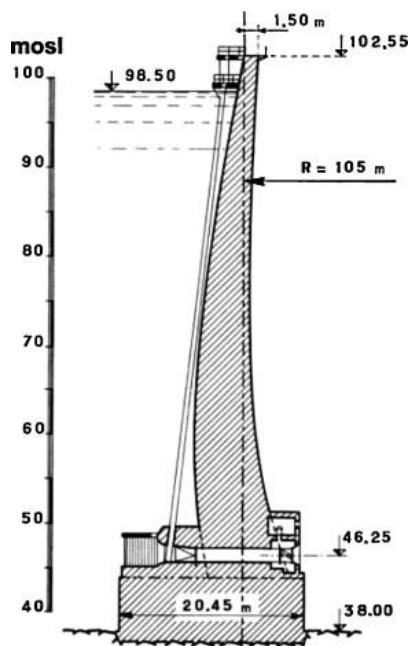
Highest dam cross section (mosl means meter over sea level). The support of the hollow valve and its control gate explains the widened foundation at this place only. Crest elevation: 102.55 m over sea level; spillway elevation: 100.4 m; normal operation level: 98.5 m; bedrock level: 38 m.
